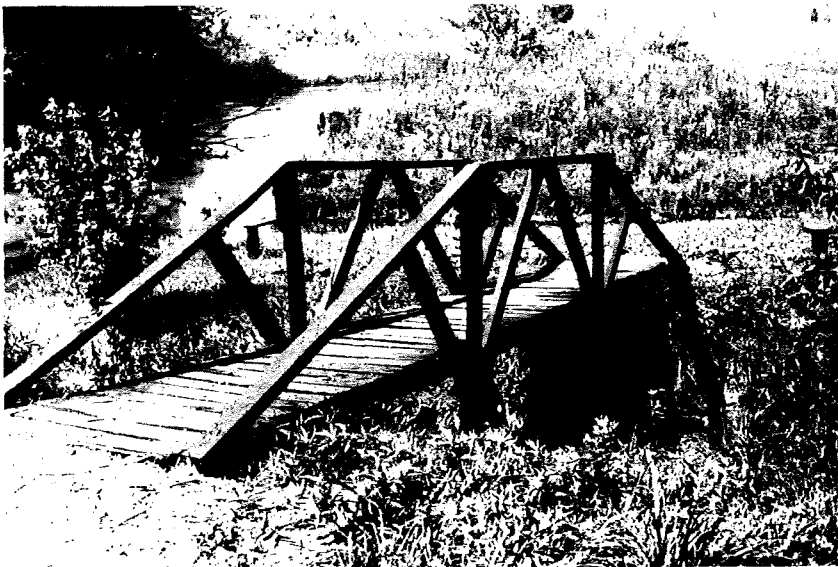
Newly constructed footbridge, part of the Outlet Works hiking trail
